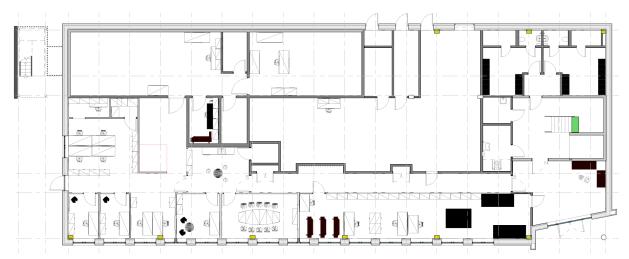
Floor plan, 1st floor. Illustration: ABO Plan og Arkitektur.
